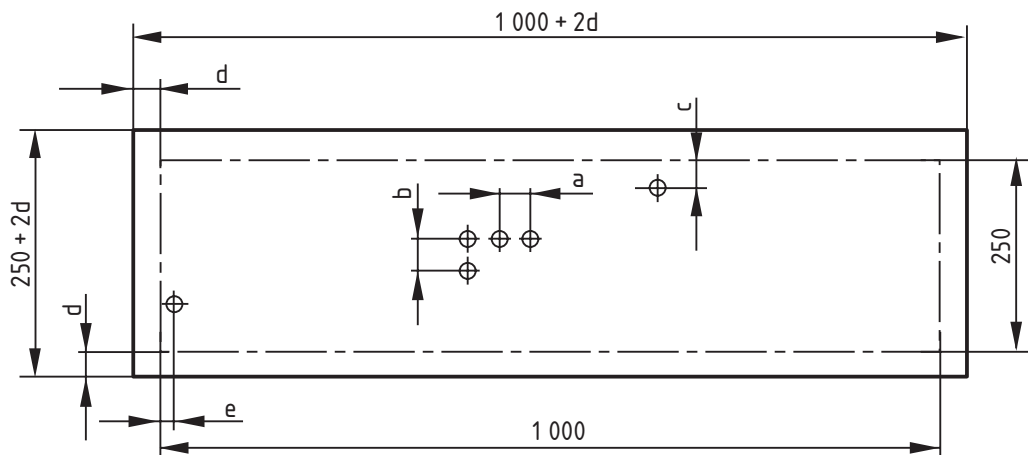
Arrangement of surface thermocouples for smoke control damper mounted outside the furnace
